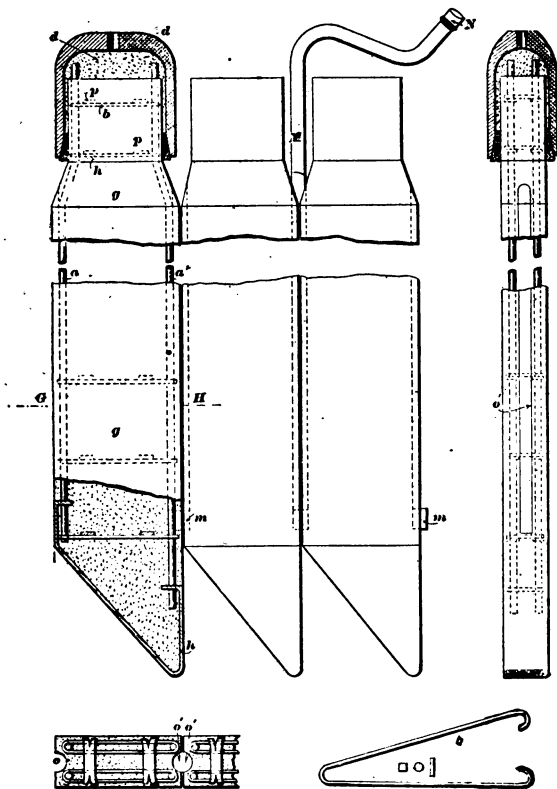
Details of Reinforced Concrete Sheet Piles.
